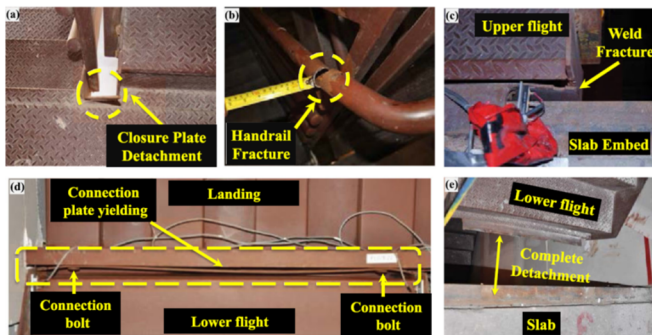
Damage to stairs observed in full-scale testing at UCSD (from Wang et al. 2015)
